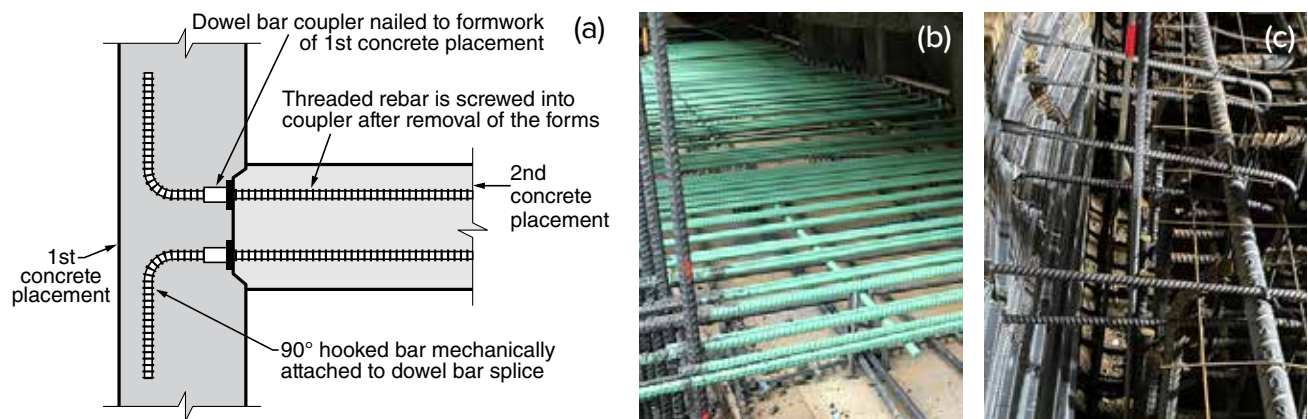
Examples of dowel bar couplers at construction joints: (a) a suggested detail from “*Design Guide for Economical Reinforced Concrete Structures*”; (b) couplers attached to slab formwork (image courtesy of McHugh); and (c) couplers in a foundation construction joint incorporating a stay-in-place form (image courtesy of Hensel Phelps). Note that threaded dowel bars must not be bent prior to installation in a coupler.
